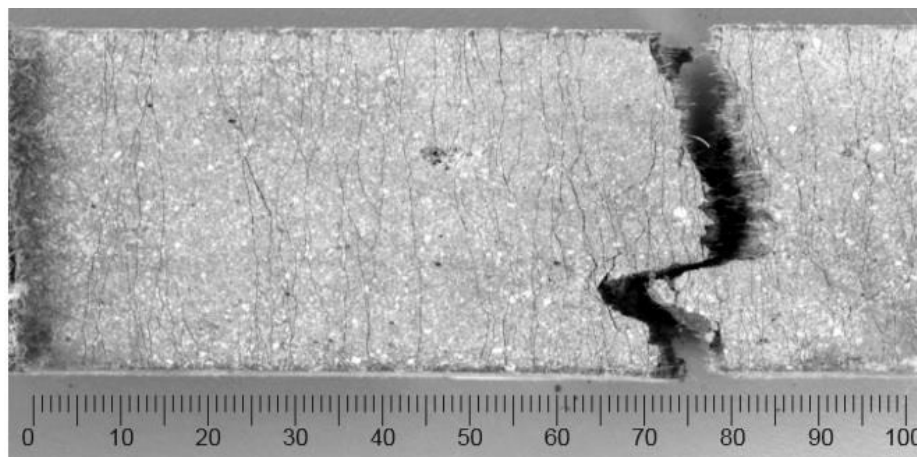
The fiber reinforced specimen cut from the 3d printed concrete element [5]
